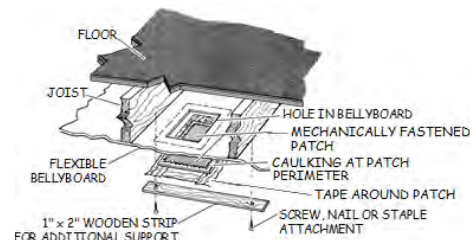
LAYERED METHOD FOR PATCHING RODENT BARRIER
